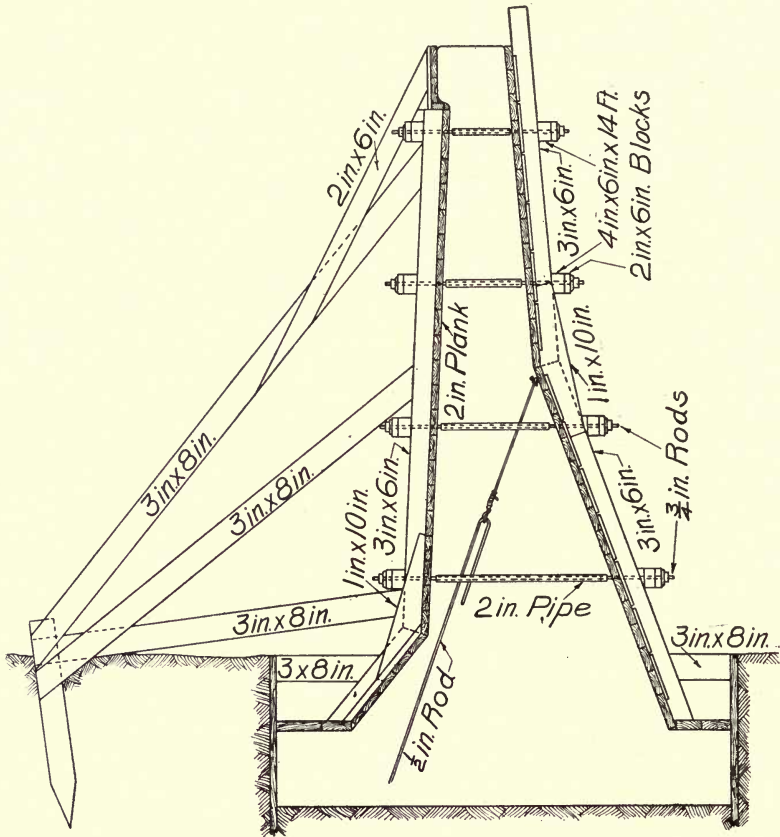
FORMS FOR RETAINING WALL, C., B. & Q. R. R.
